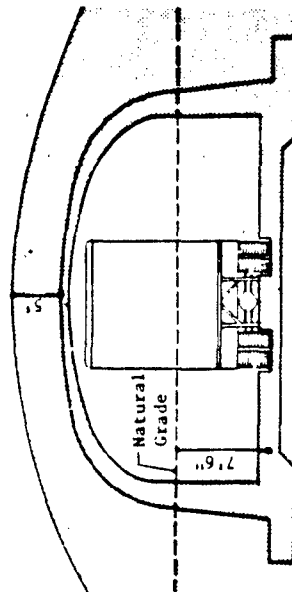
ALTERNATIVE A--BASELINE CONCRETE BUILDING.
